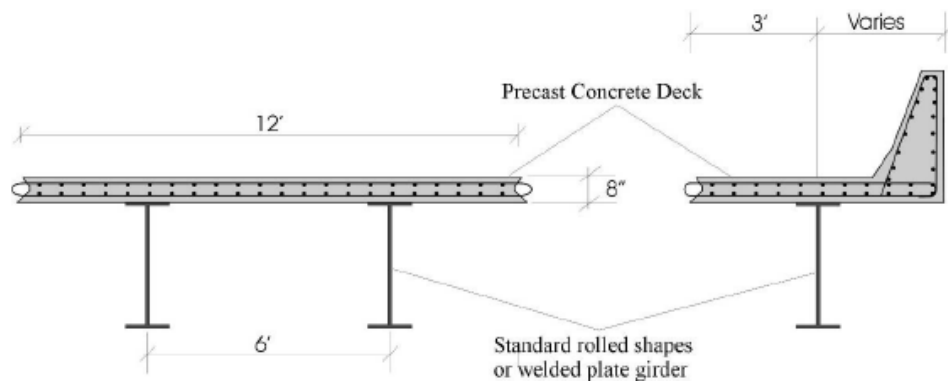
Modular Precast Concrete Bridge Concept (SDR Engineering Consultants 2005)
